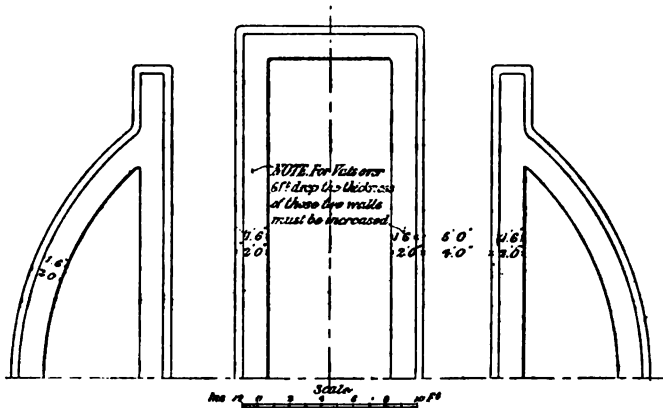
Pier with Projections for carrying Staging; Half Plan.
